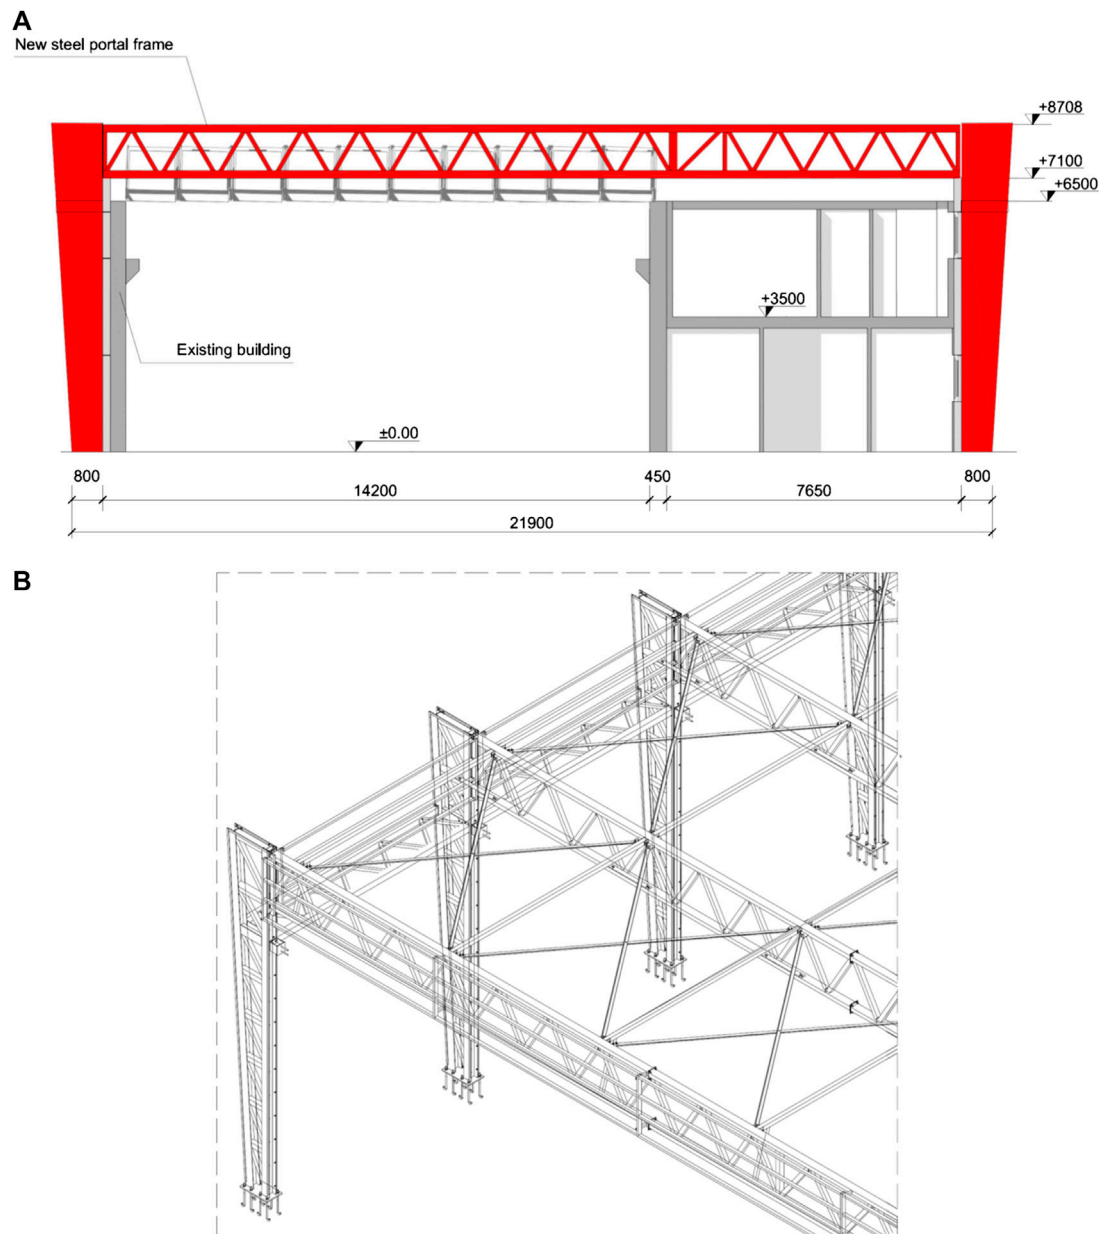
| Steel portal frames with laced built-up columns and truss beams used as earthquake resistant system at the outside of an existing precast building: (A) cross-sectional view of the building after the intervention; (B) three-dimensional view of the new steel structure. Dimensions in mm.
